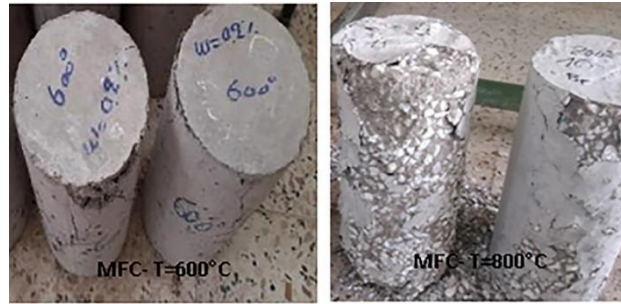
The appearance of fiber concrete specimen metallic (CMF) at the exit of the oven
